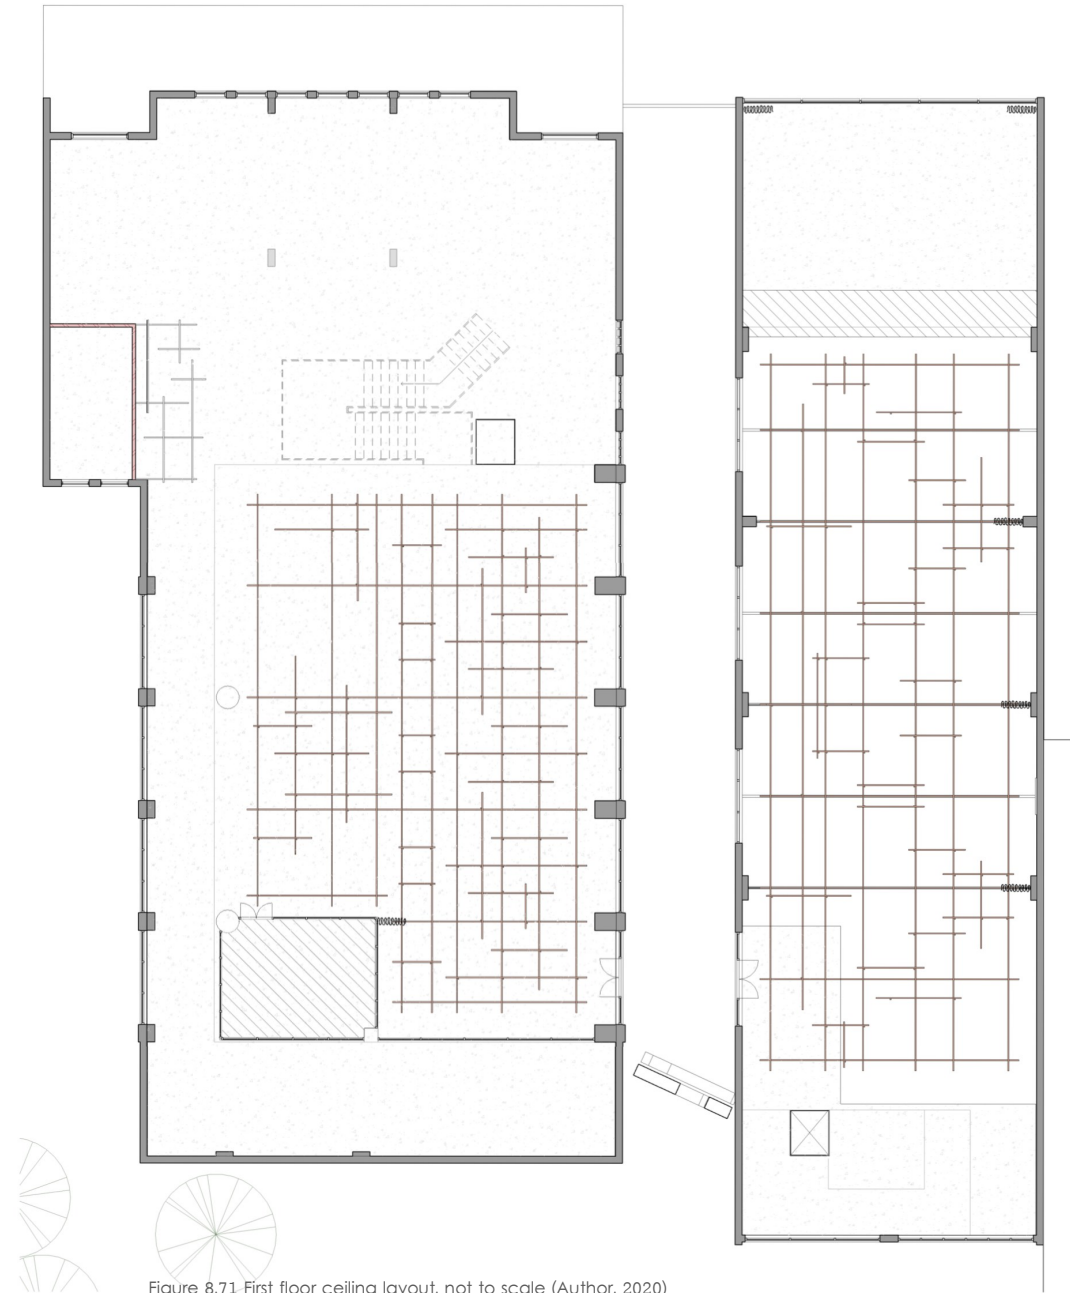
First floor ceiling layout, not to scale (Author, 2020)
